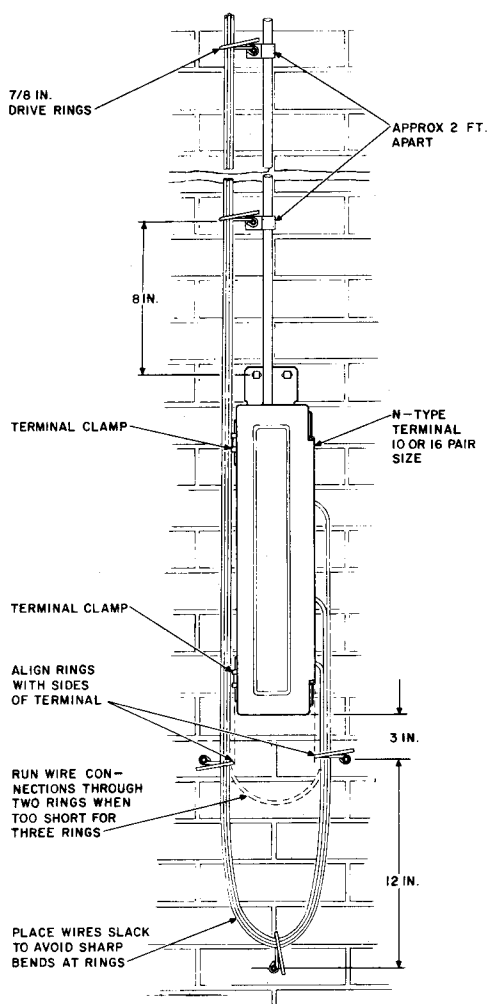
Wall Mounted 10- or 16-Pair Cable Terminal With Stub at Top
